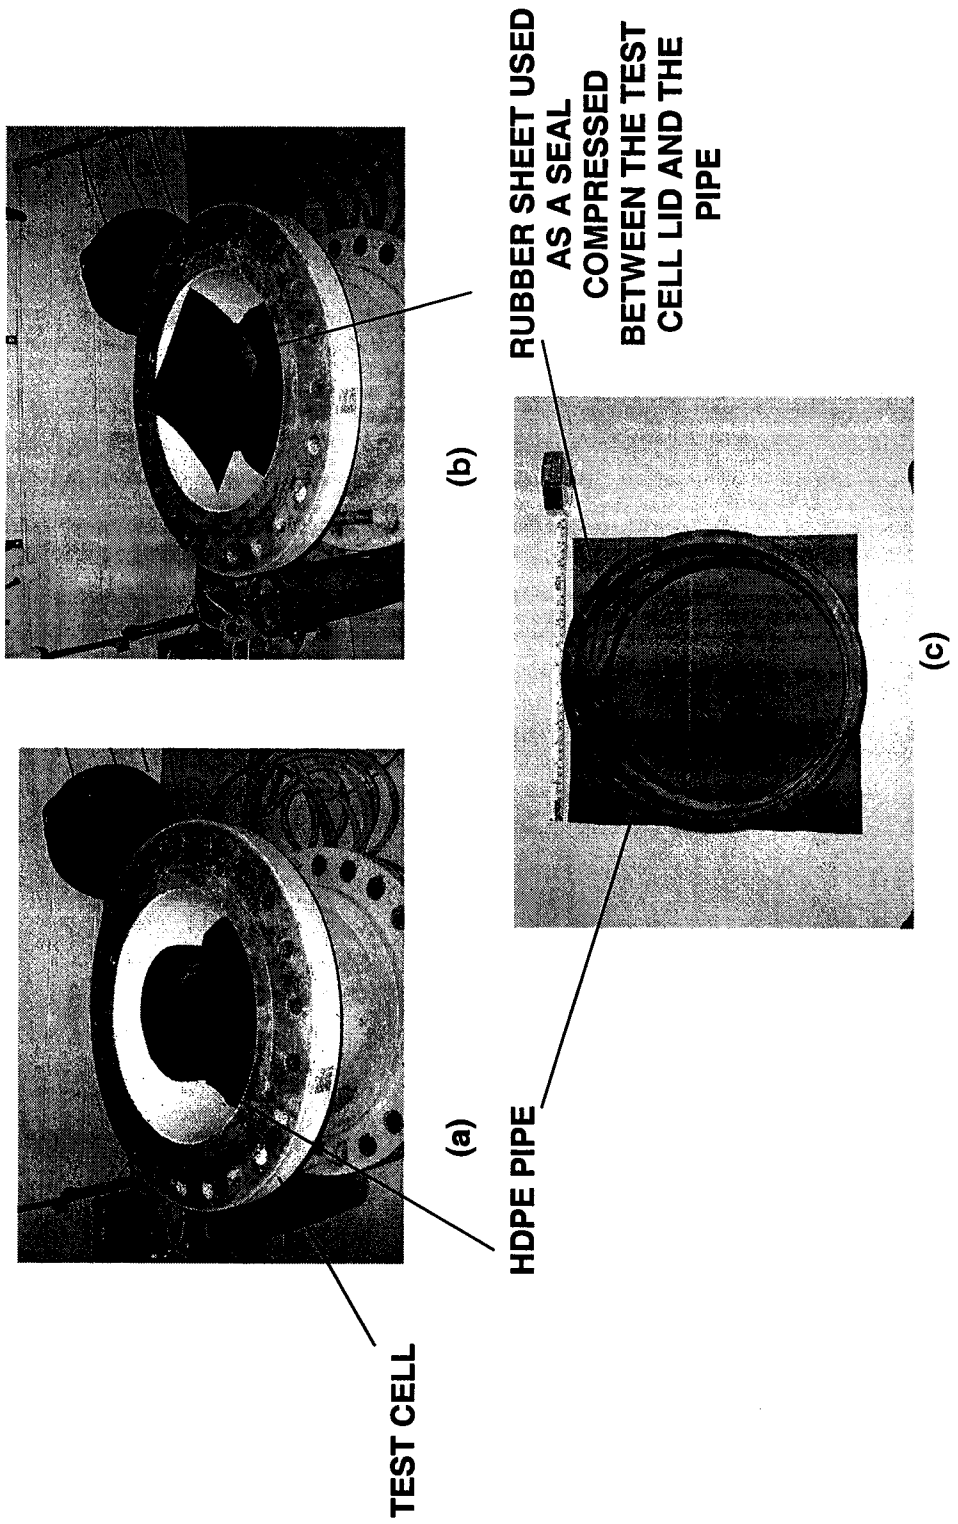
PHOTOGRAPHS SHOWING THE TESTED SEAL THAT COULD HAD KEPT THE END OF THE PIPE FREE TO DEFORM RADially (a) TEST CELL AND HDPE PIPE, (b) TEST CELL, HDPE PIPE AND SEAL, (c) PLAN VIEW OF THE HDPE PIPE AND SEAL
